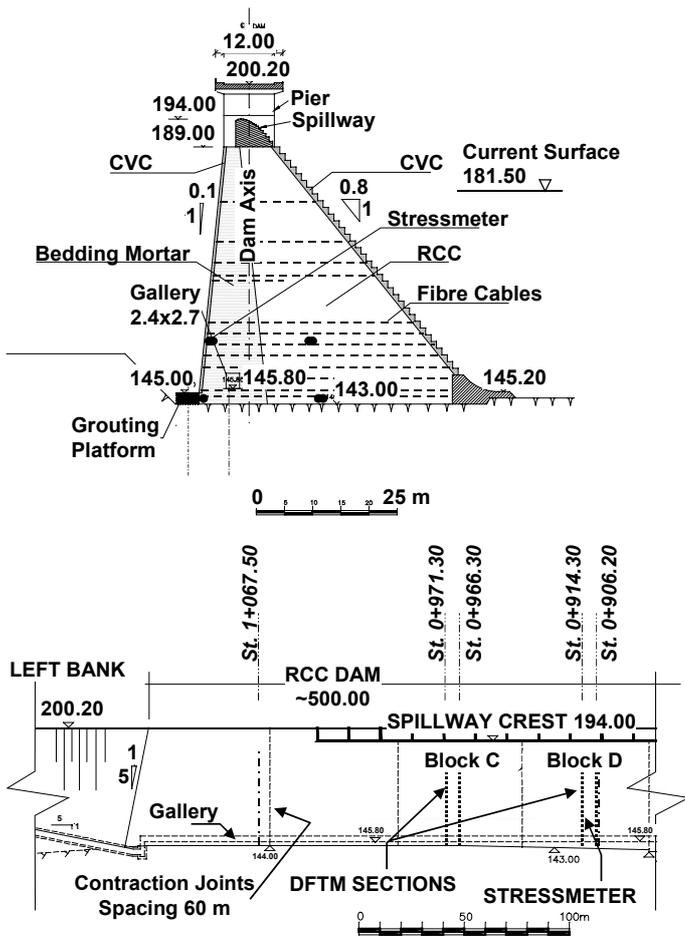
Mujib Dam: Cross section and longitudinal section of the left bank.
